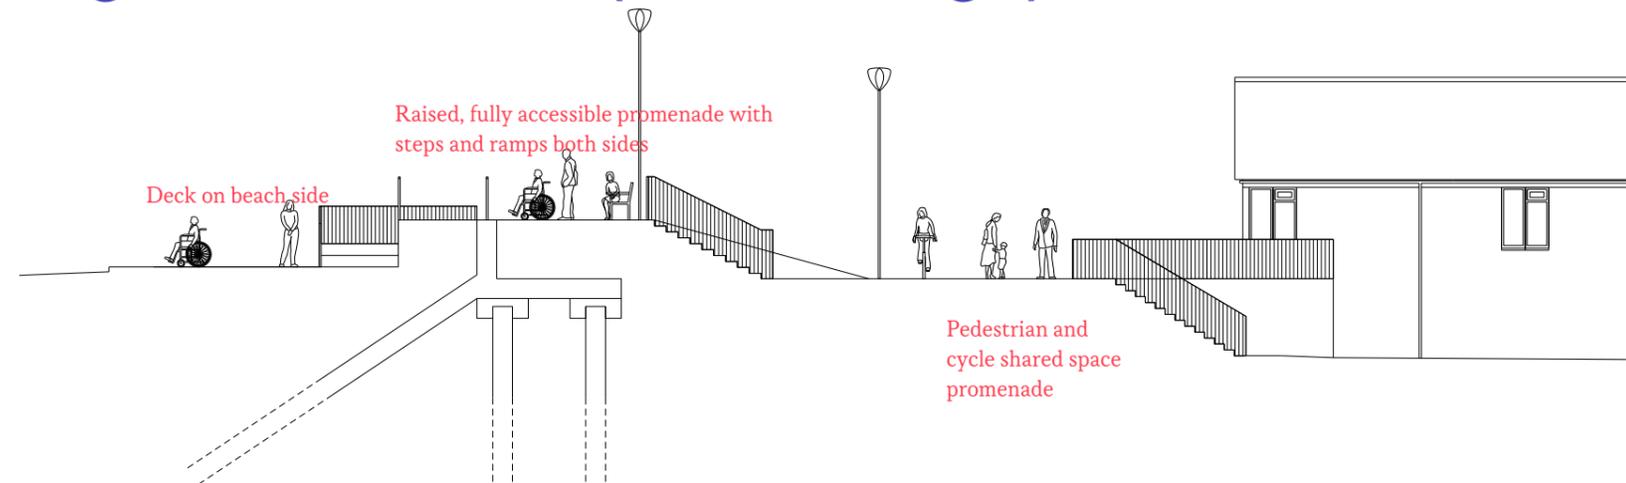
Indicative cross-section showing the design approach to the Village seafront
